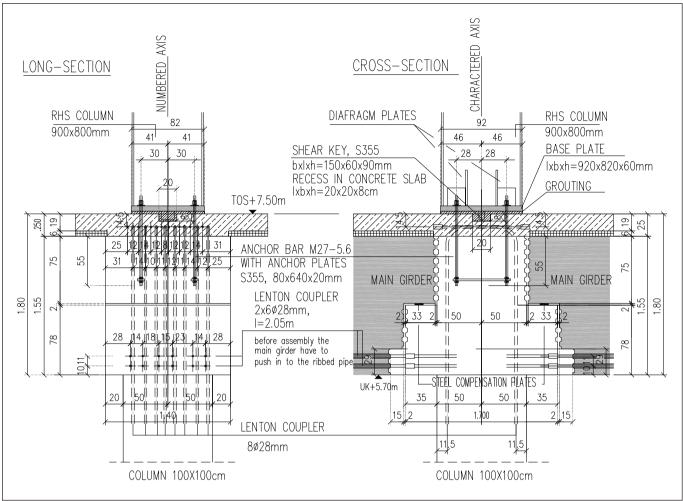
Column-main girder rigid connection detail (detail from tender document)
